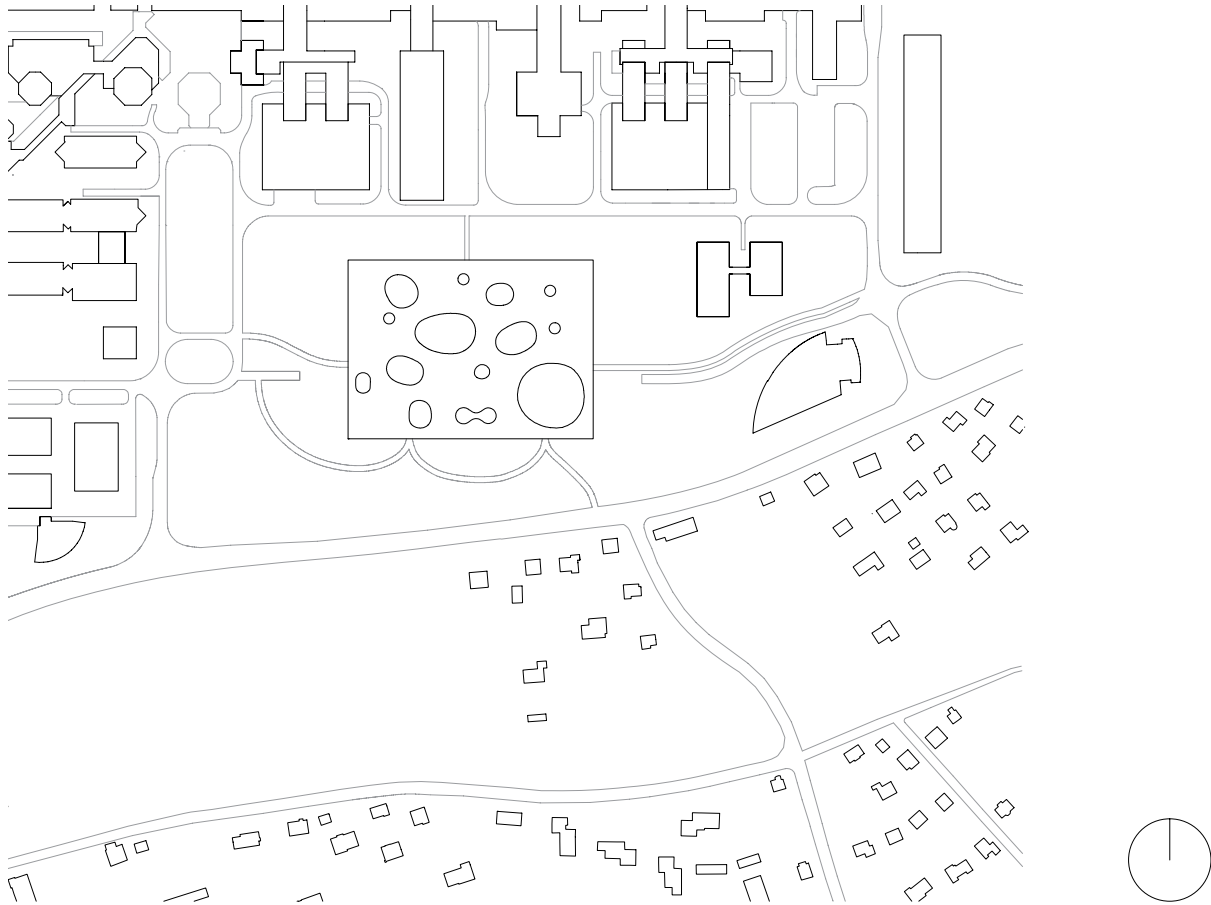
Site Plan of Rolex Learning Centre 1:5'000
